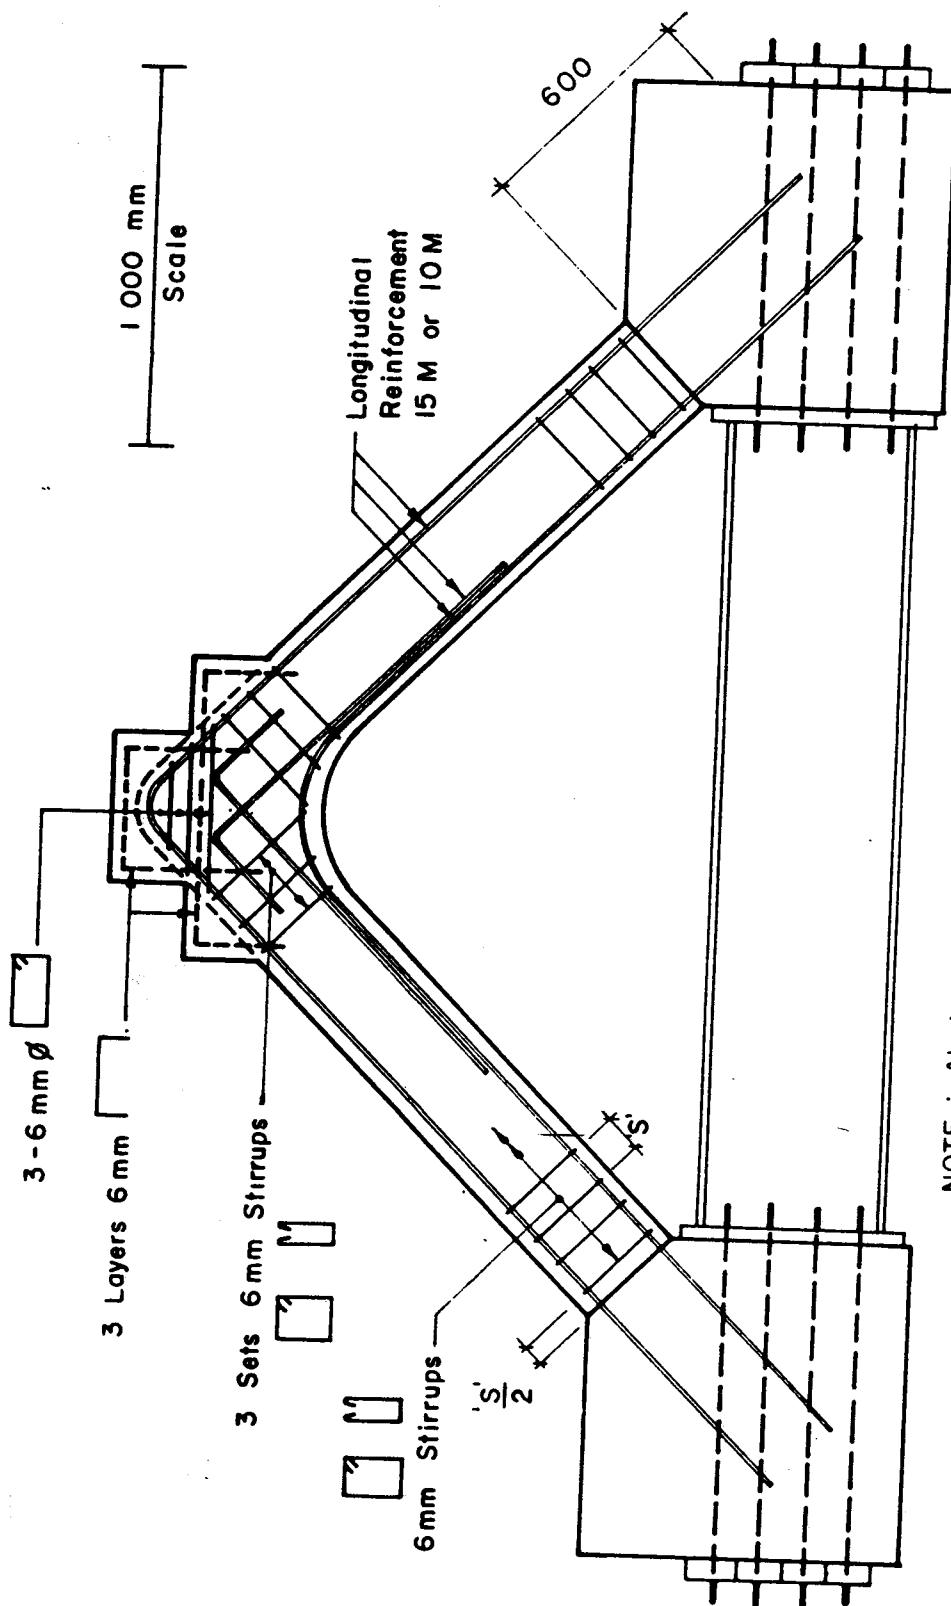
General Reinforcing Layout for A-Series Specimens
